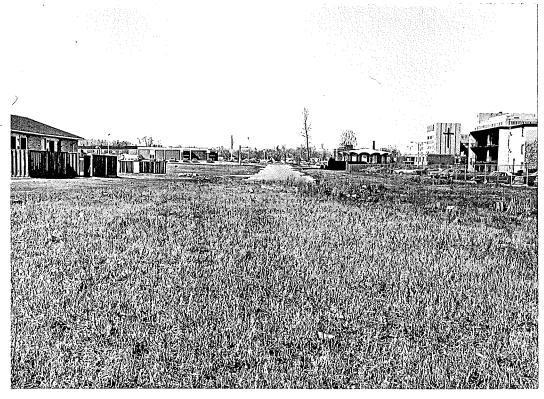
Existing East Blvd, looking northeast from Woodward Ave.
